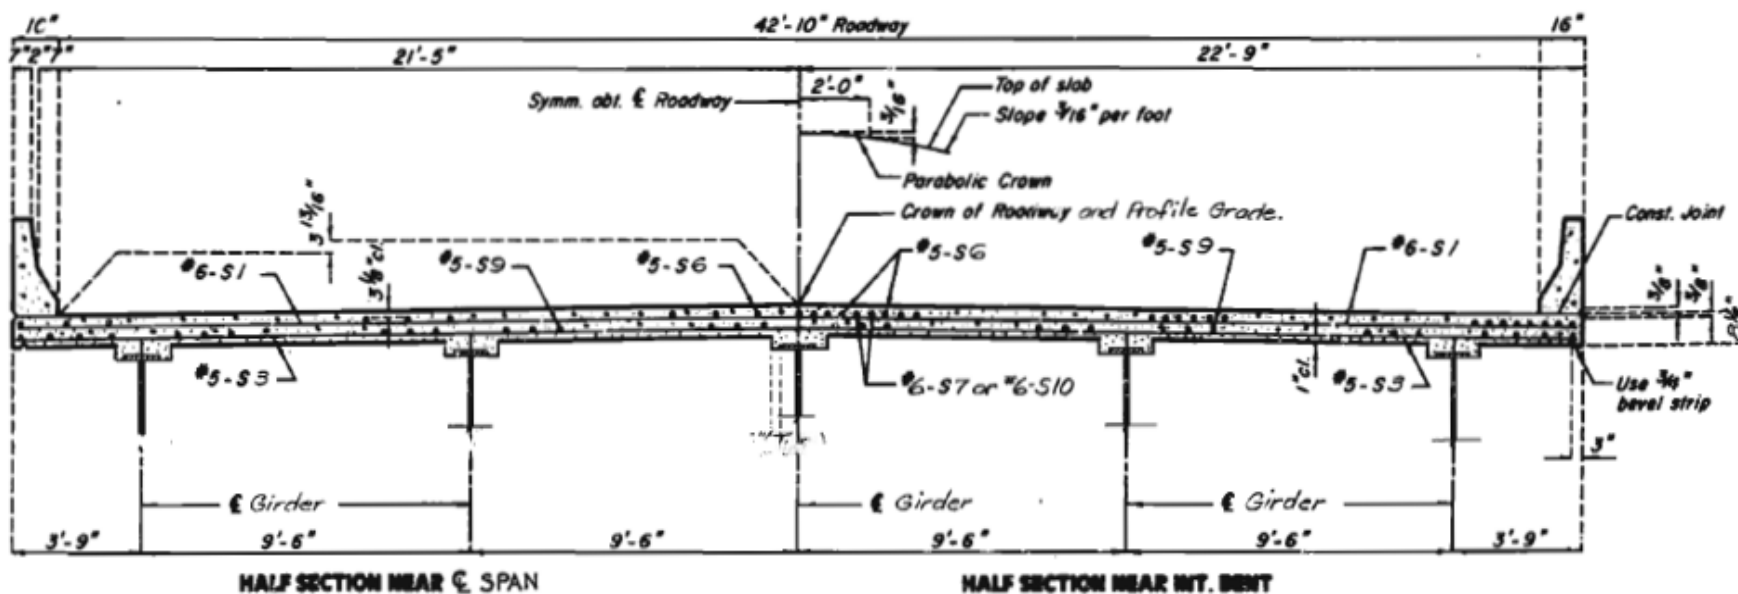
Cross-Section of Bridge A4709 (Mexico, MO)
